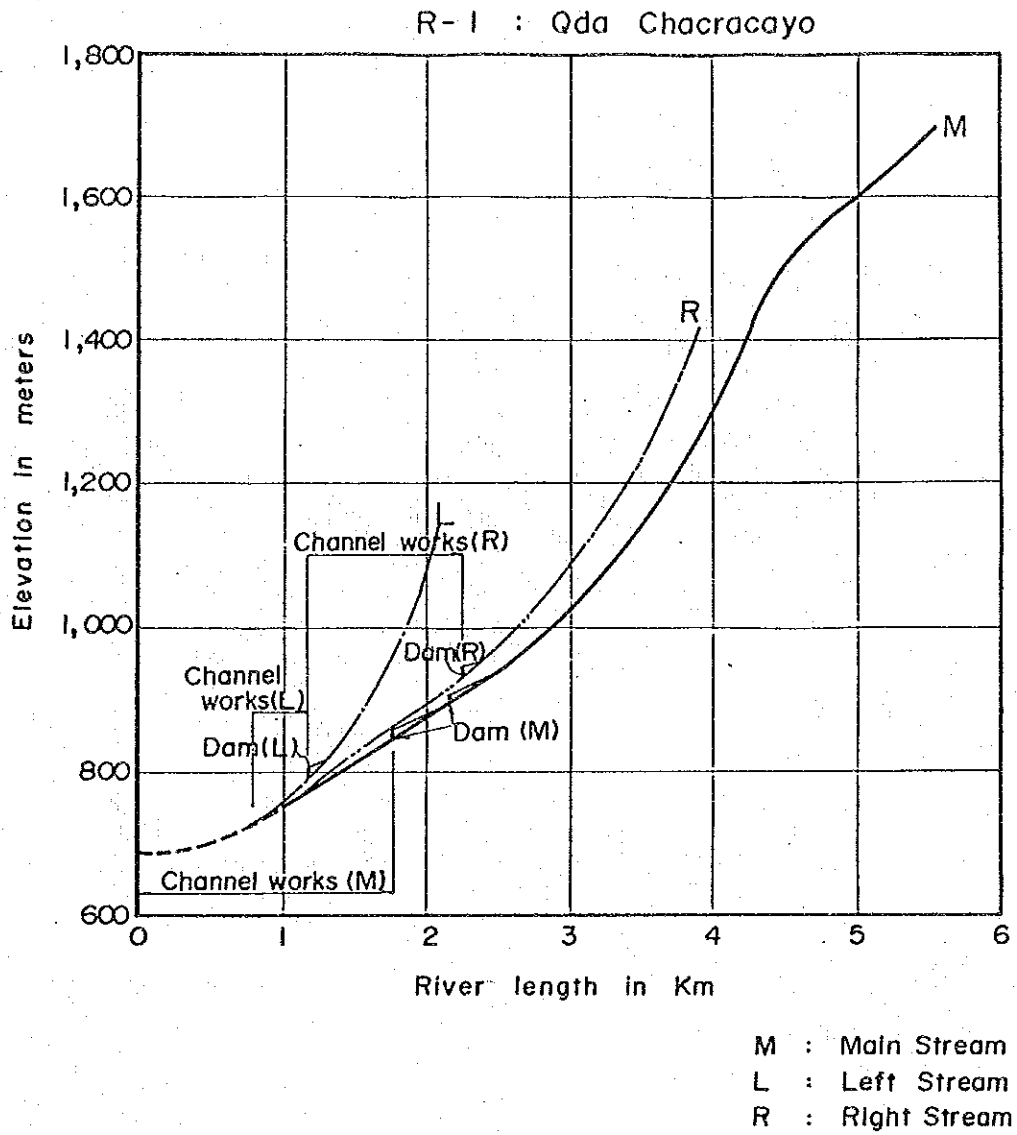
Structural Plan on Profile of Qda Chacracayo (R1)
